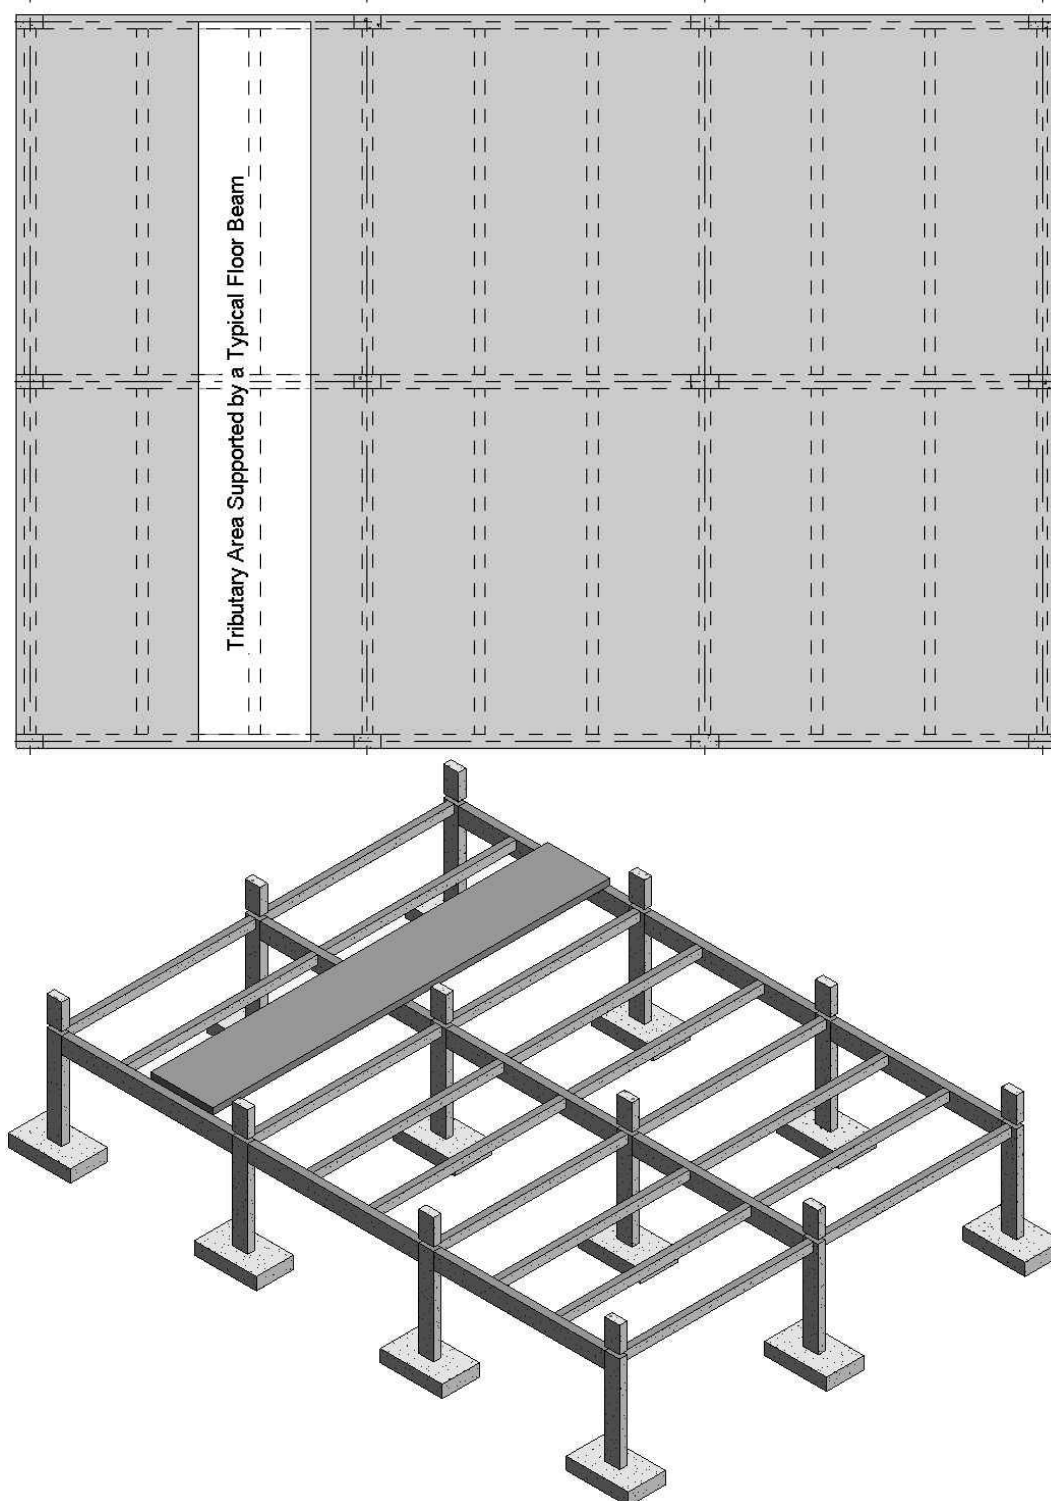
Tributary area supported by a typical interior floor beam.
